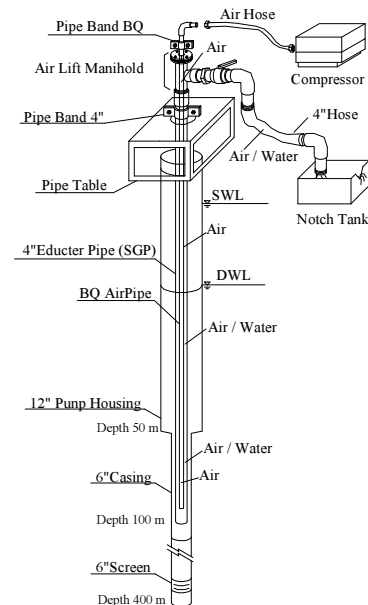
Connectional Drawing of Air-Lift Equipment Installation (for Production Wells)
